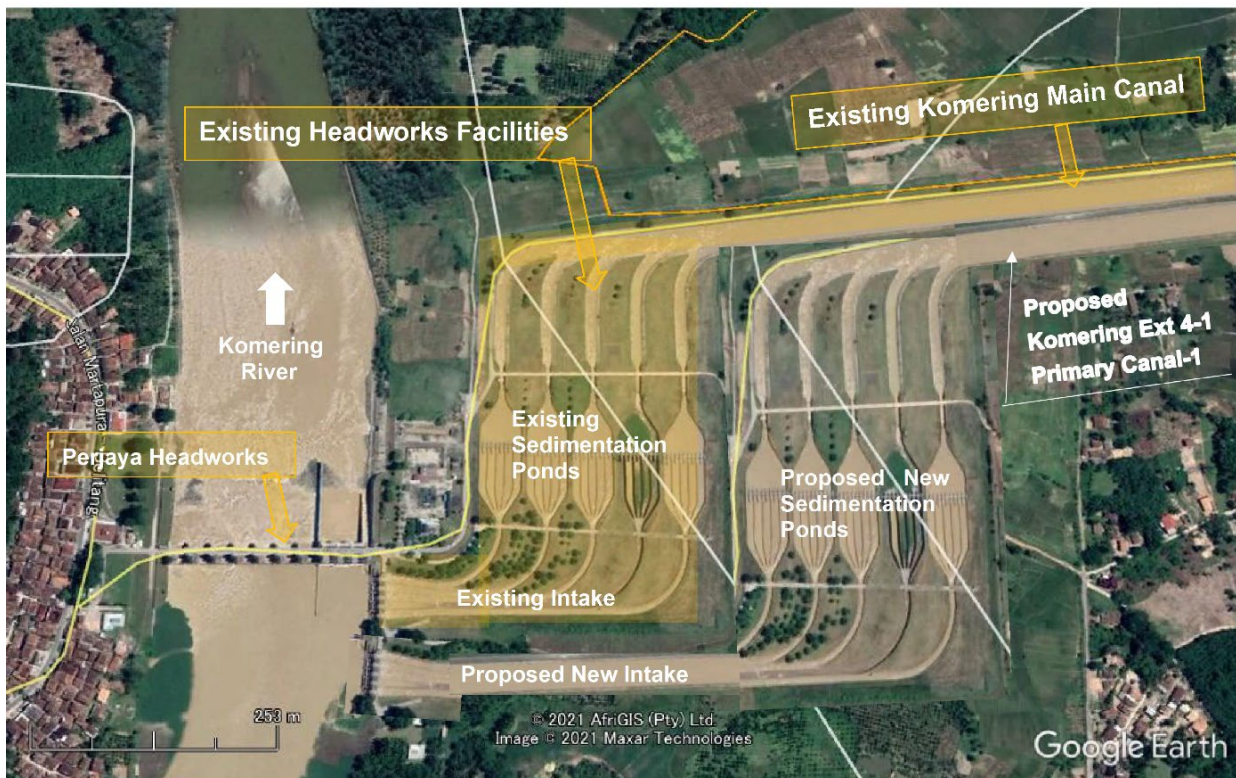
Plan of the Intake and Primary Canal of Komerling Extension Scheme No.4-1
